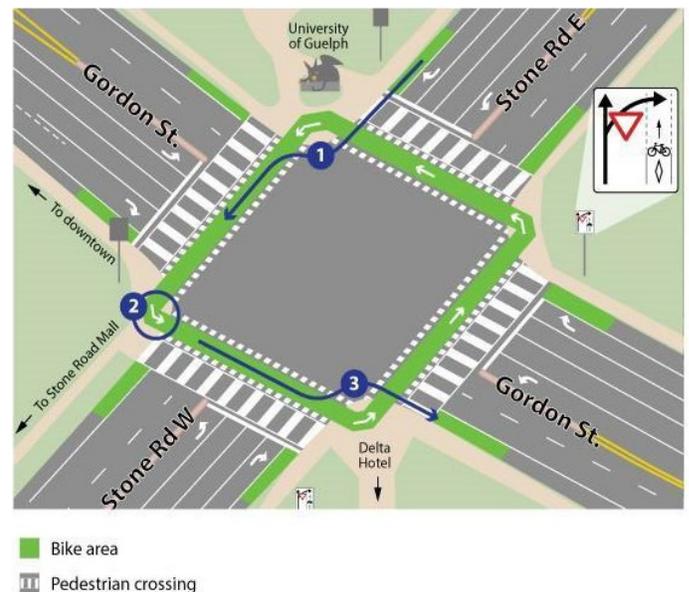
Dedicated intersection at Gordon Street and Stone Road
